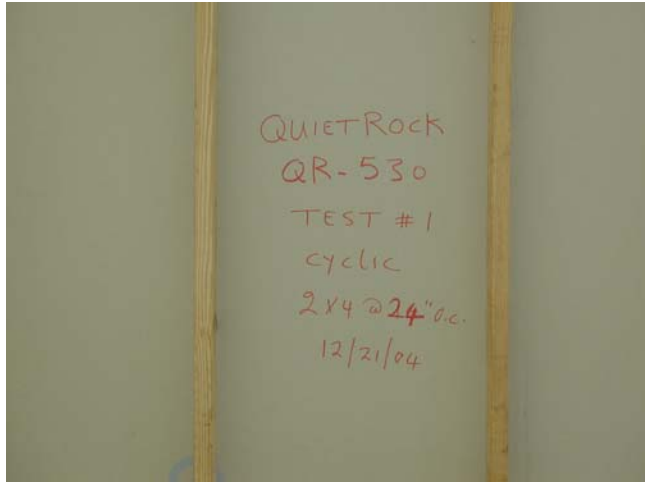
SPECIMEN 1 CONFIGURATION (TEST 1)
